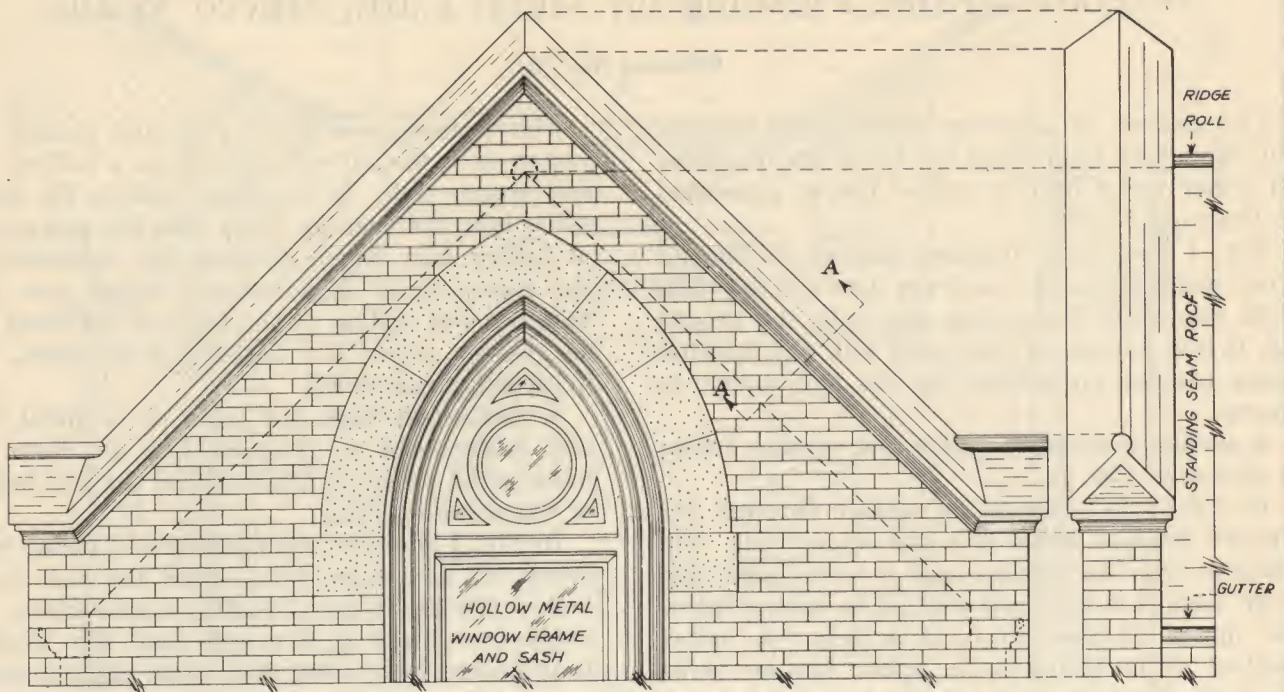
FRONT AND SIDE ELEVATIONS OF SHEET METAL COPING WITH HEAD BLOCKS, OVER BRICK GABLE WALL
